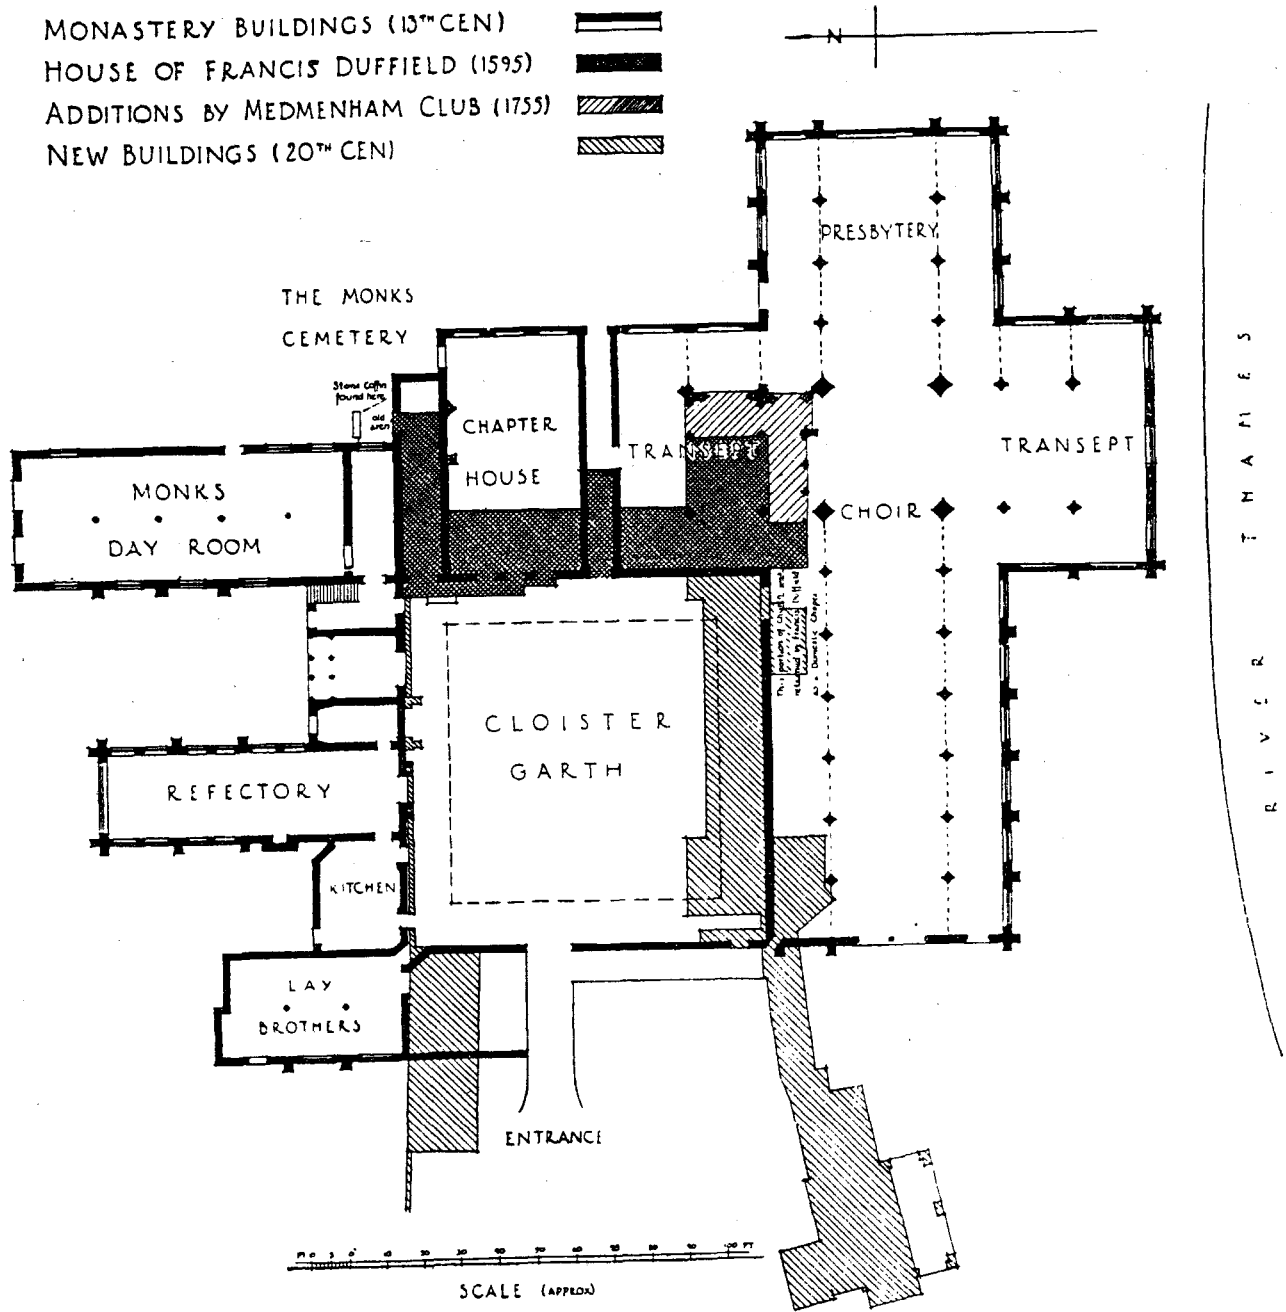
Hypothetical reconstruction plan of Medmenham Abbey, from Plaisted (1925)
